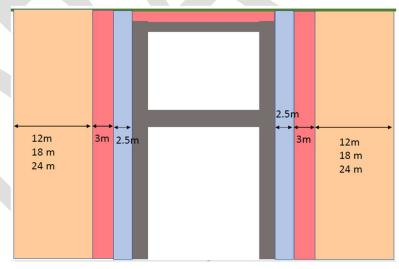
Cut & Cover Section Protection and Exclusion Zones
